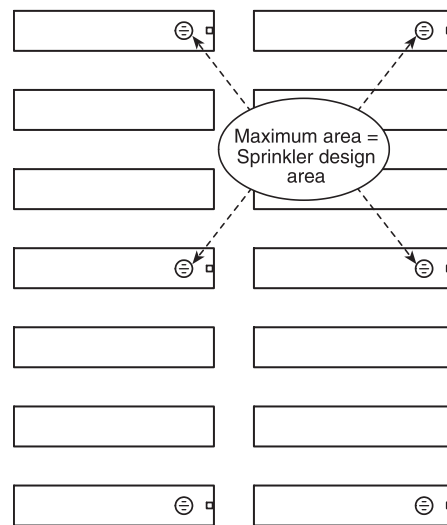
(b) Plan View of Warehouse Spill Control of Liquids.
